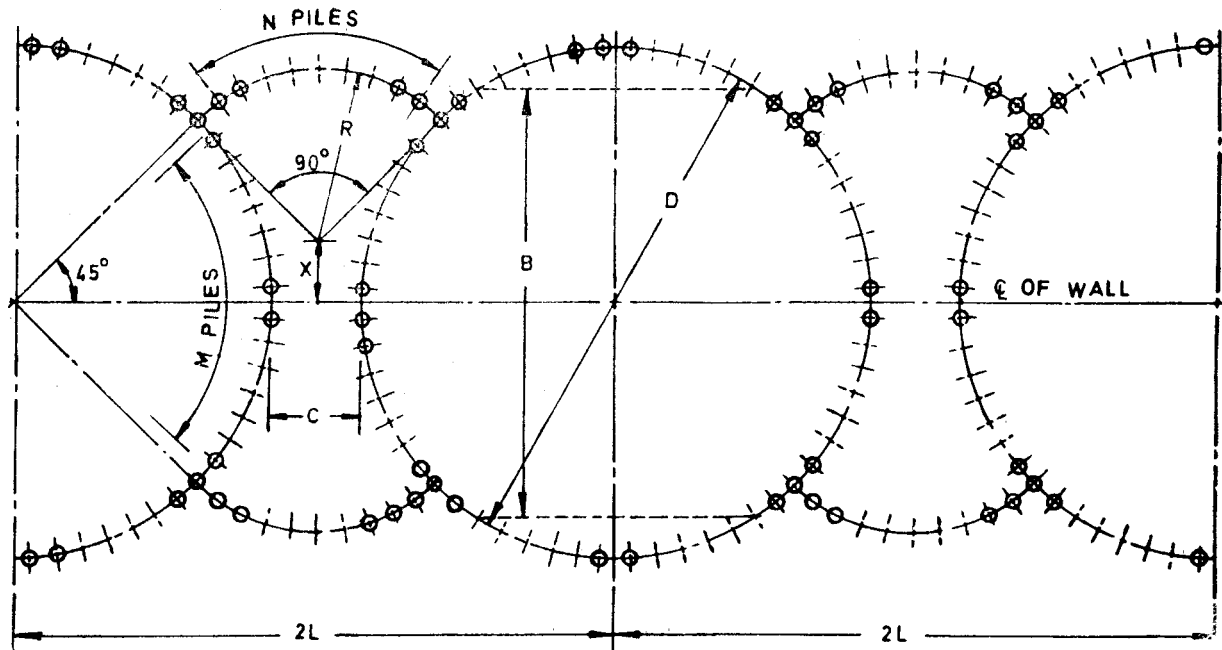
DETAILS FOR LAY OUT OF CIRCULAR CELLULAR TYPE SHEET PILES
